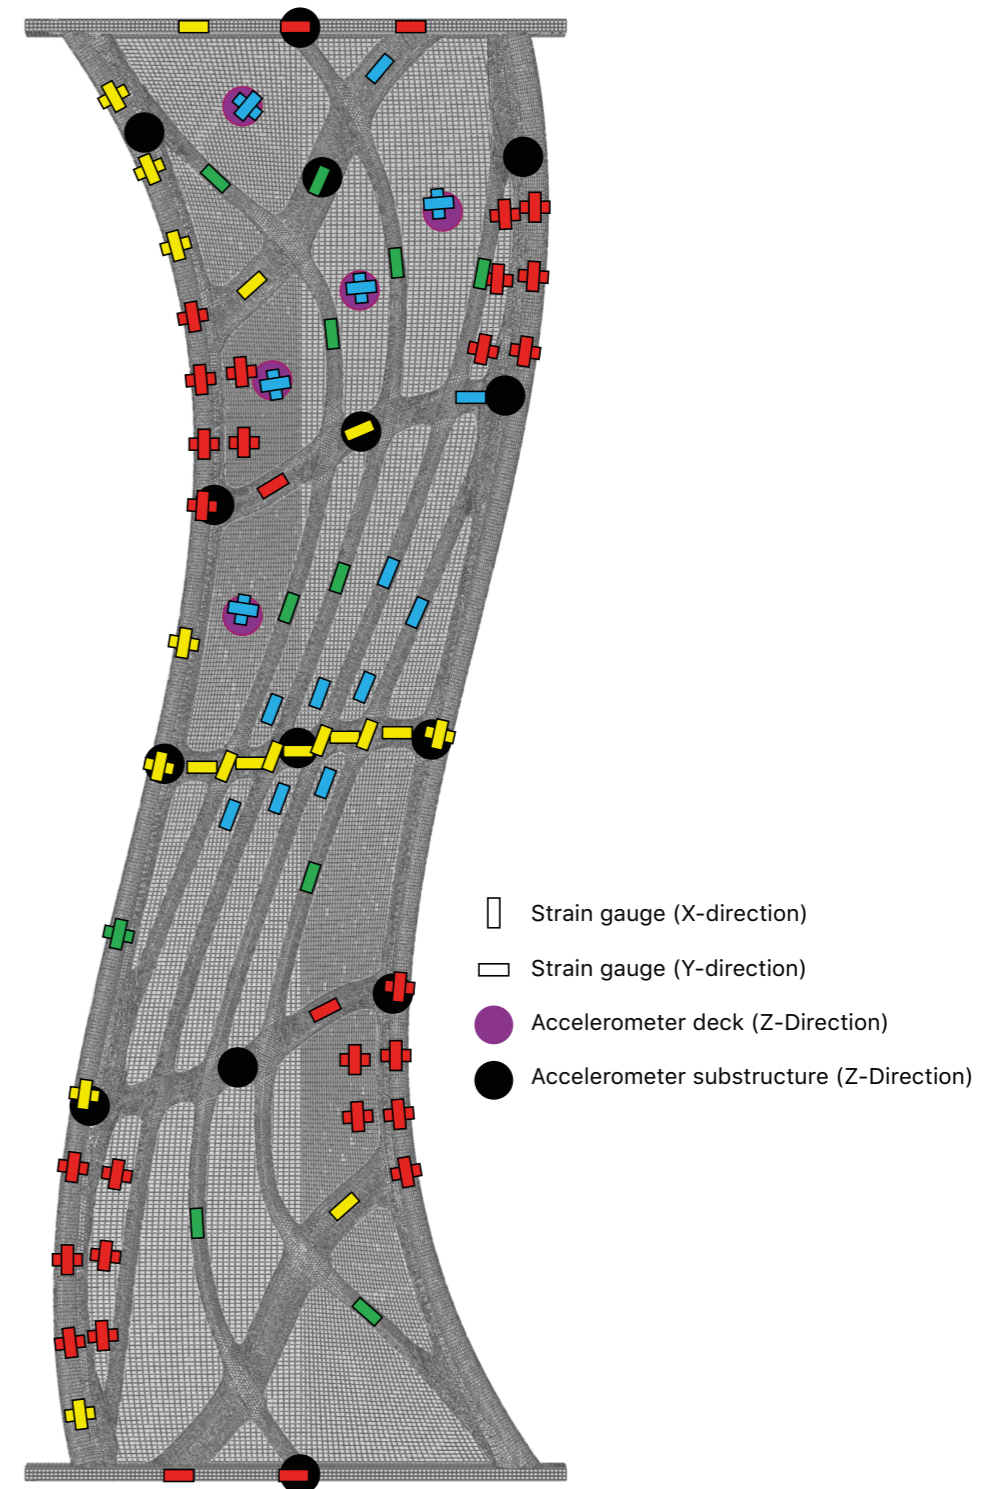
Top view of the bridge; Sensor placement for the substructure and deck of the MX3D bridge (Arup, 2018).
